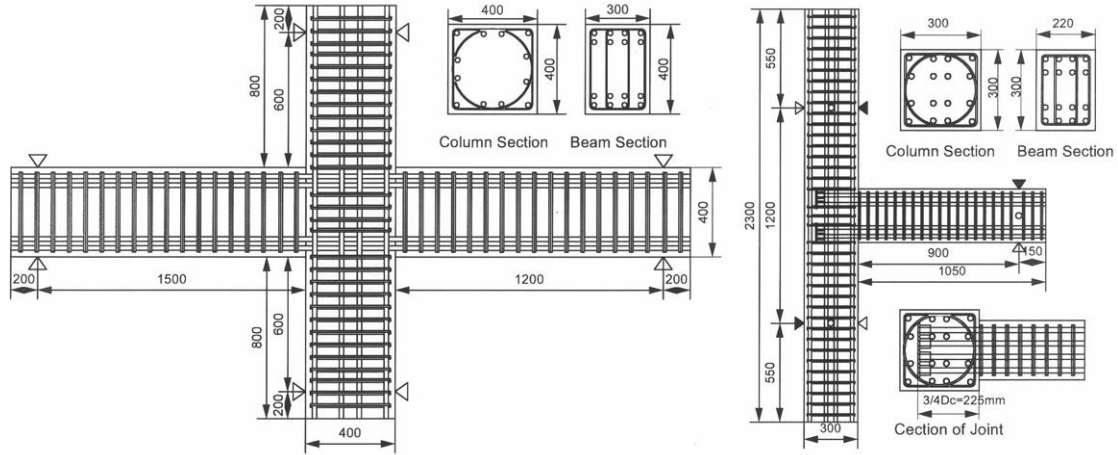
Outline of Specimen (Structural Test of HSC Joint)
